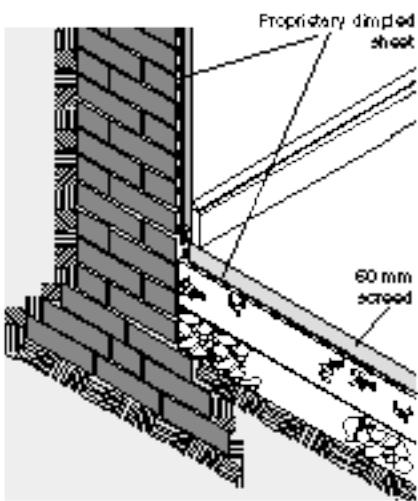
Damp-proofing a basement by dimpled sheet dry linings.
